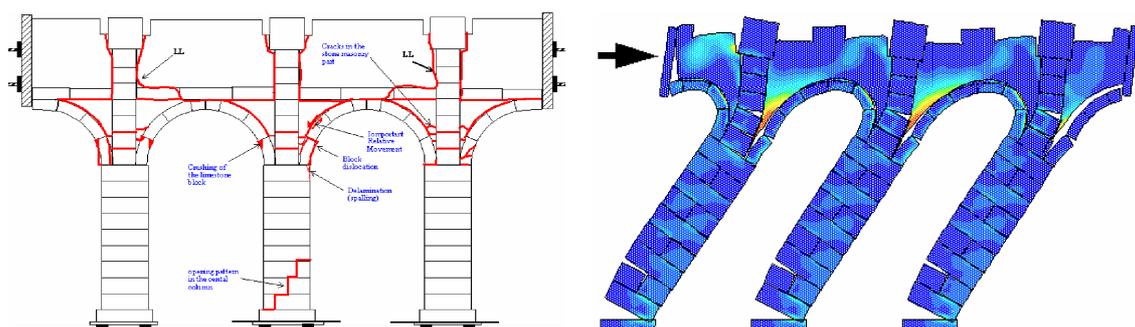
Damage and Deformation: a) Damage from tests, b) Deformation pattern (analytical results)
